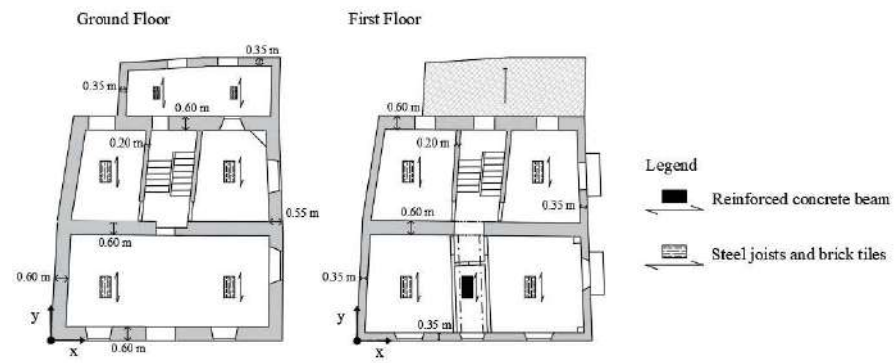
Plans of the building with the indication of the warping of horizontal structures.
